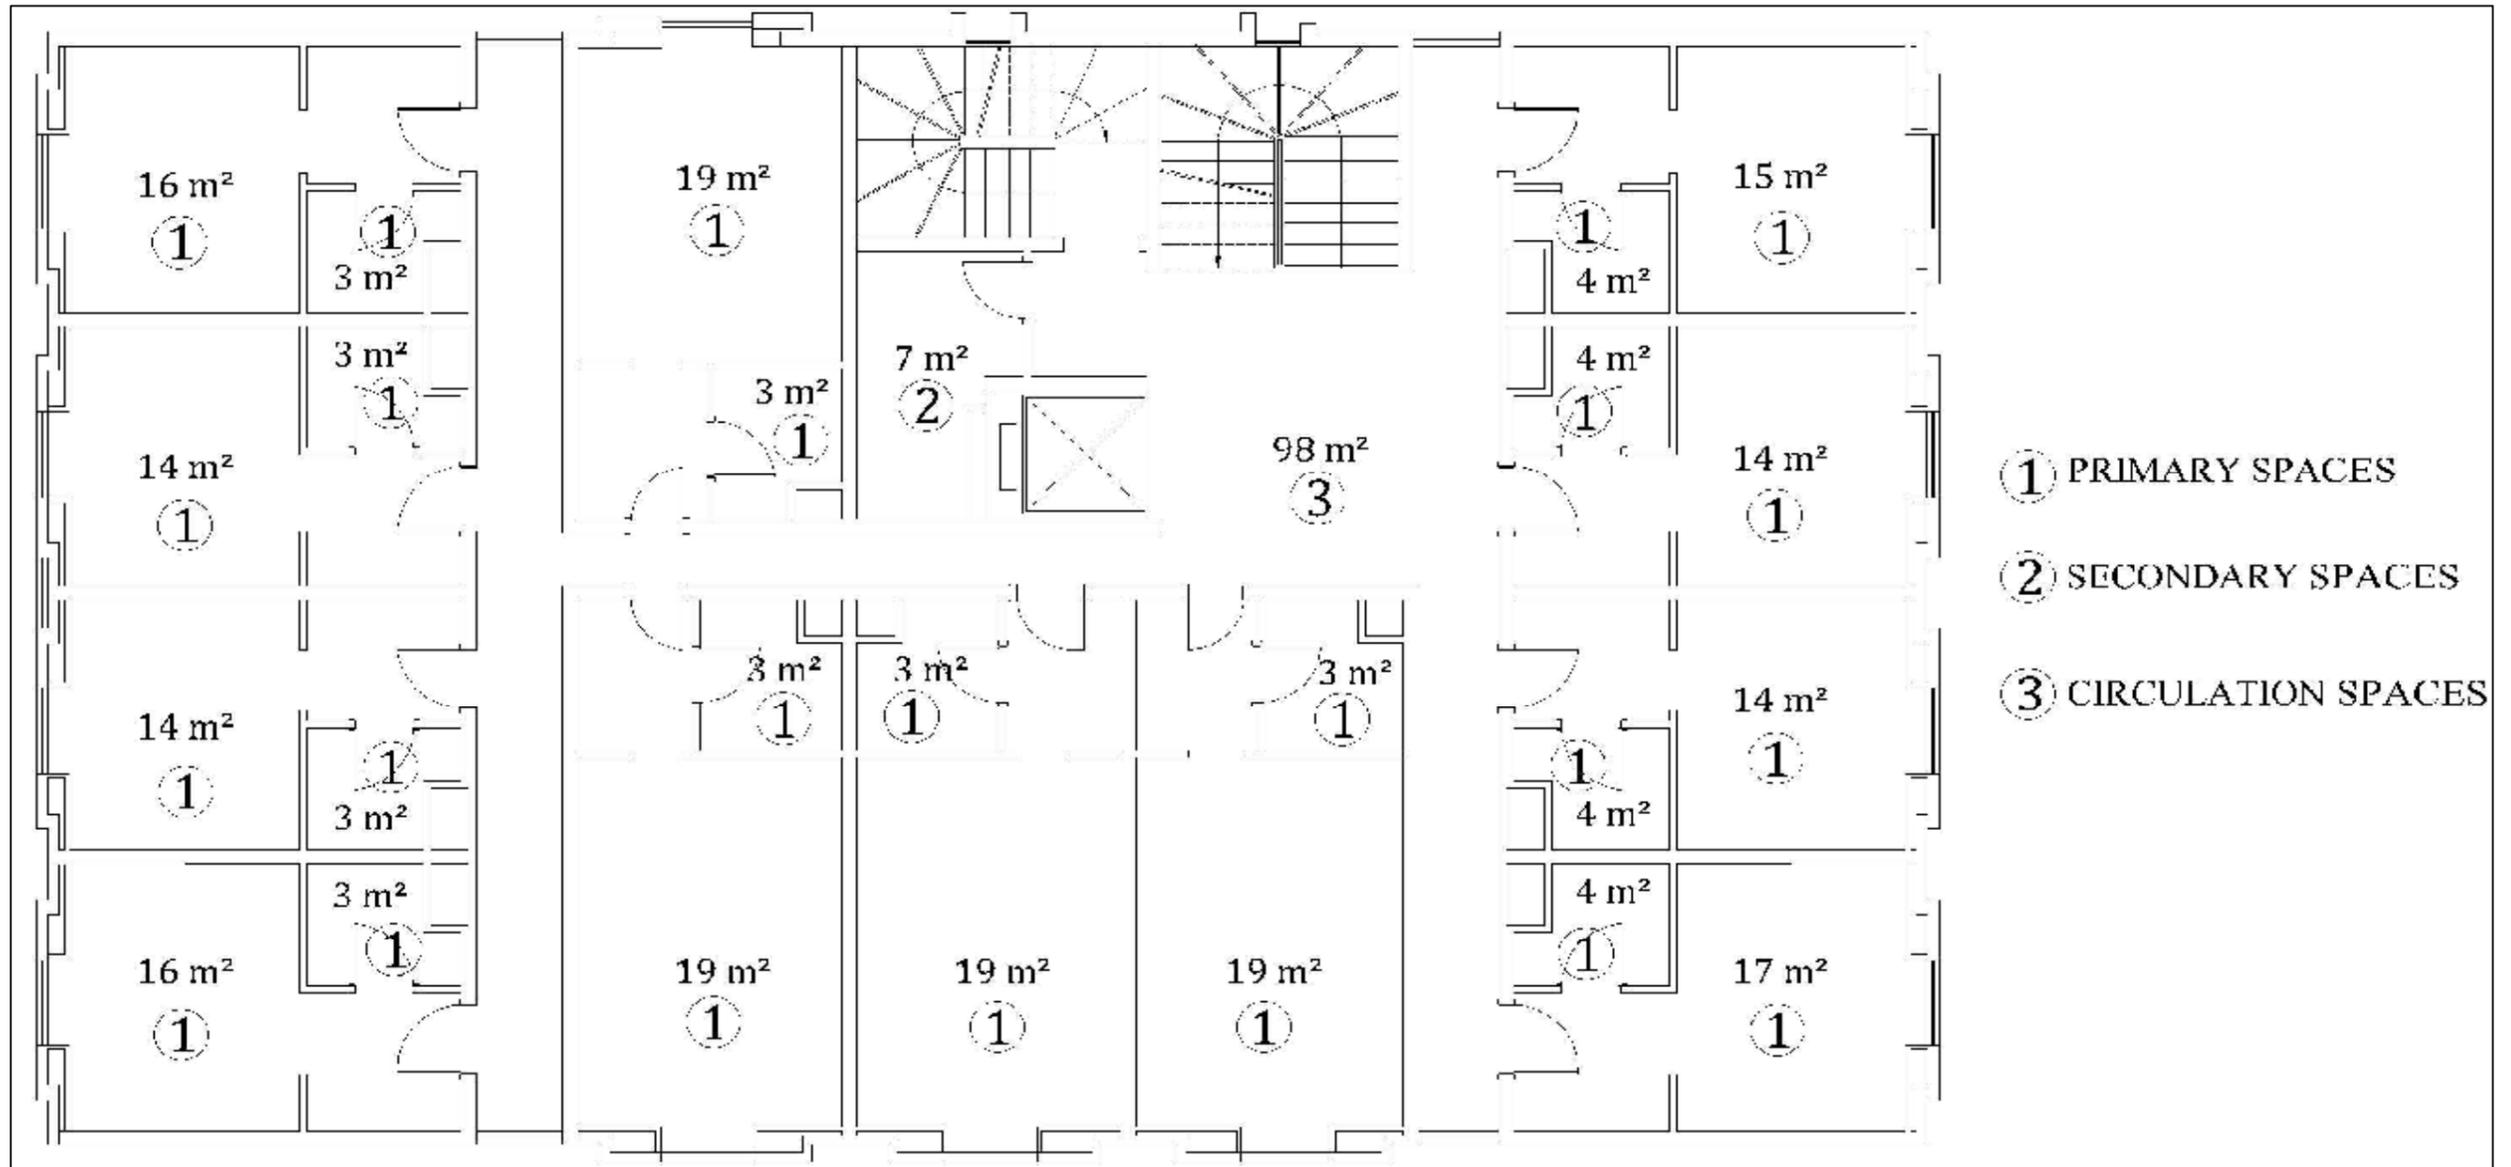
Floor plan of Sample 07 (S07) displaying, primary, secondary and circulation spaces.
